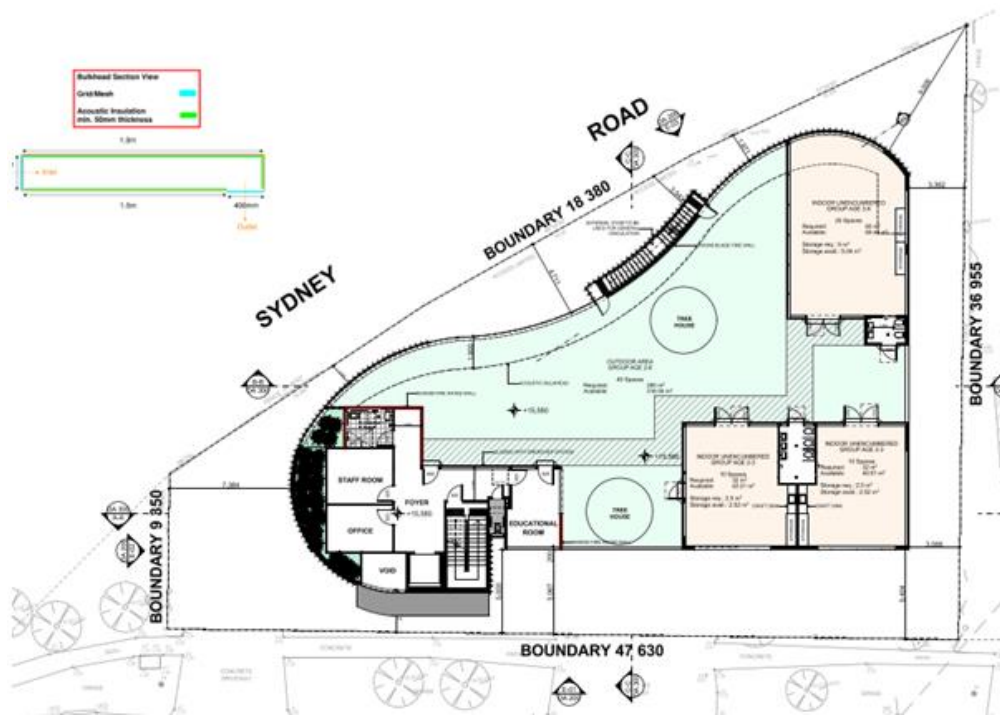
First-floor plan (outdoor children play area for 2-6 years old is fully enclosed)
